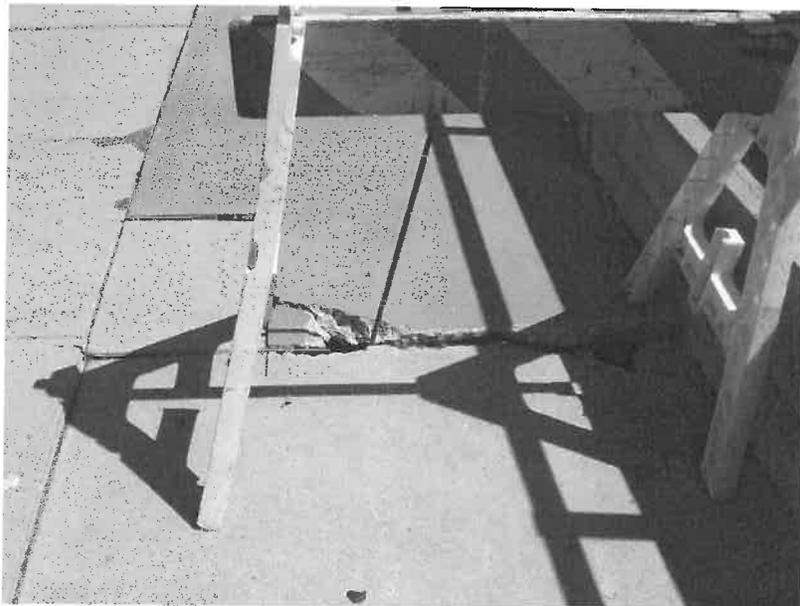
4, Naples, Top Deck Survey: Rivo Alto Canal, #133
